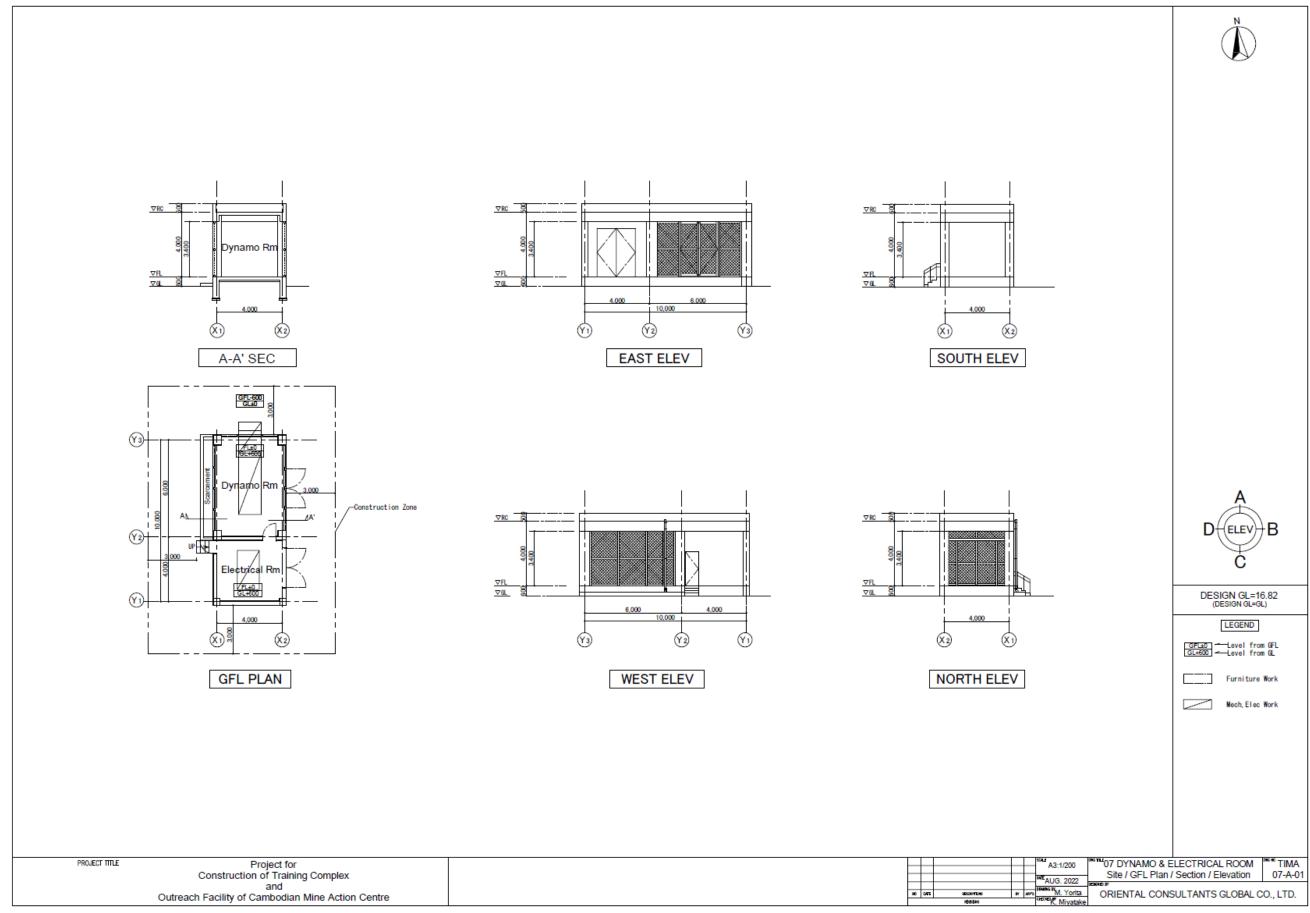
Floor Plan, Section and Elevation of TIMA Dynamo & Electrical Room
